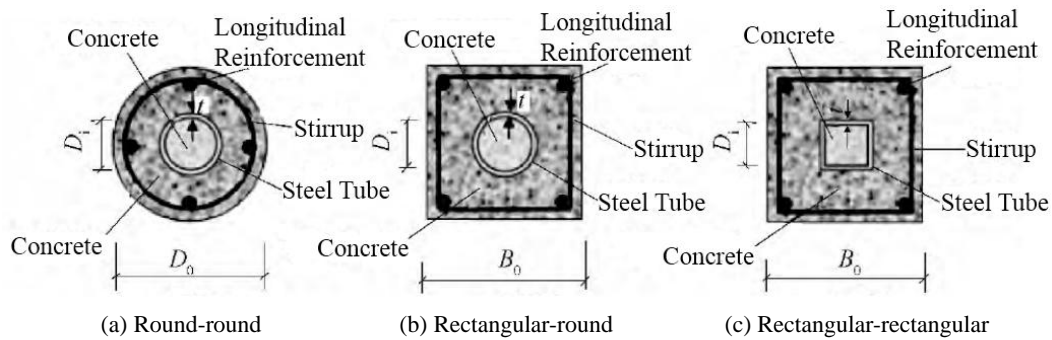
Cross sections of steel tube-reinforced concrete column structure
